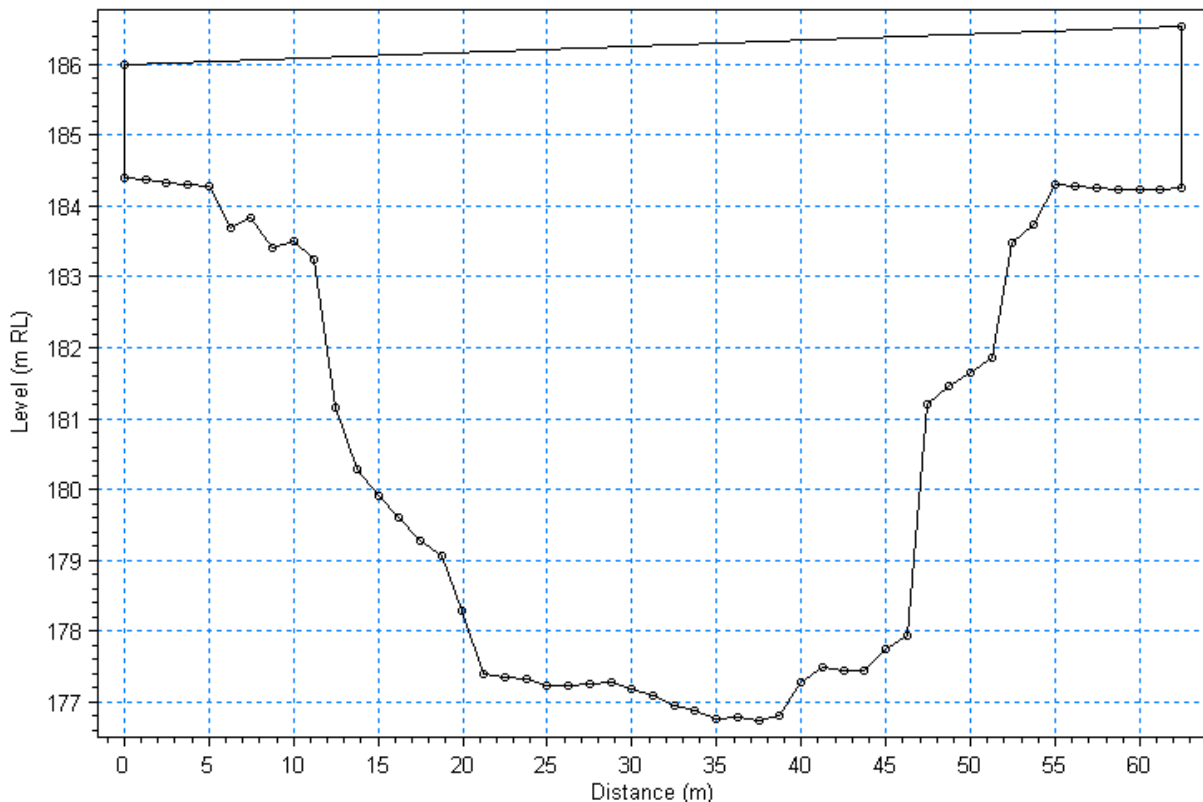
Cross-section representing the main channel under the proposed bridge
